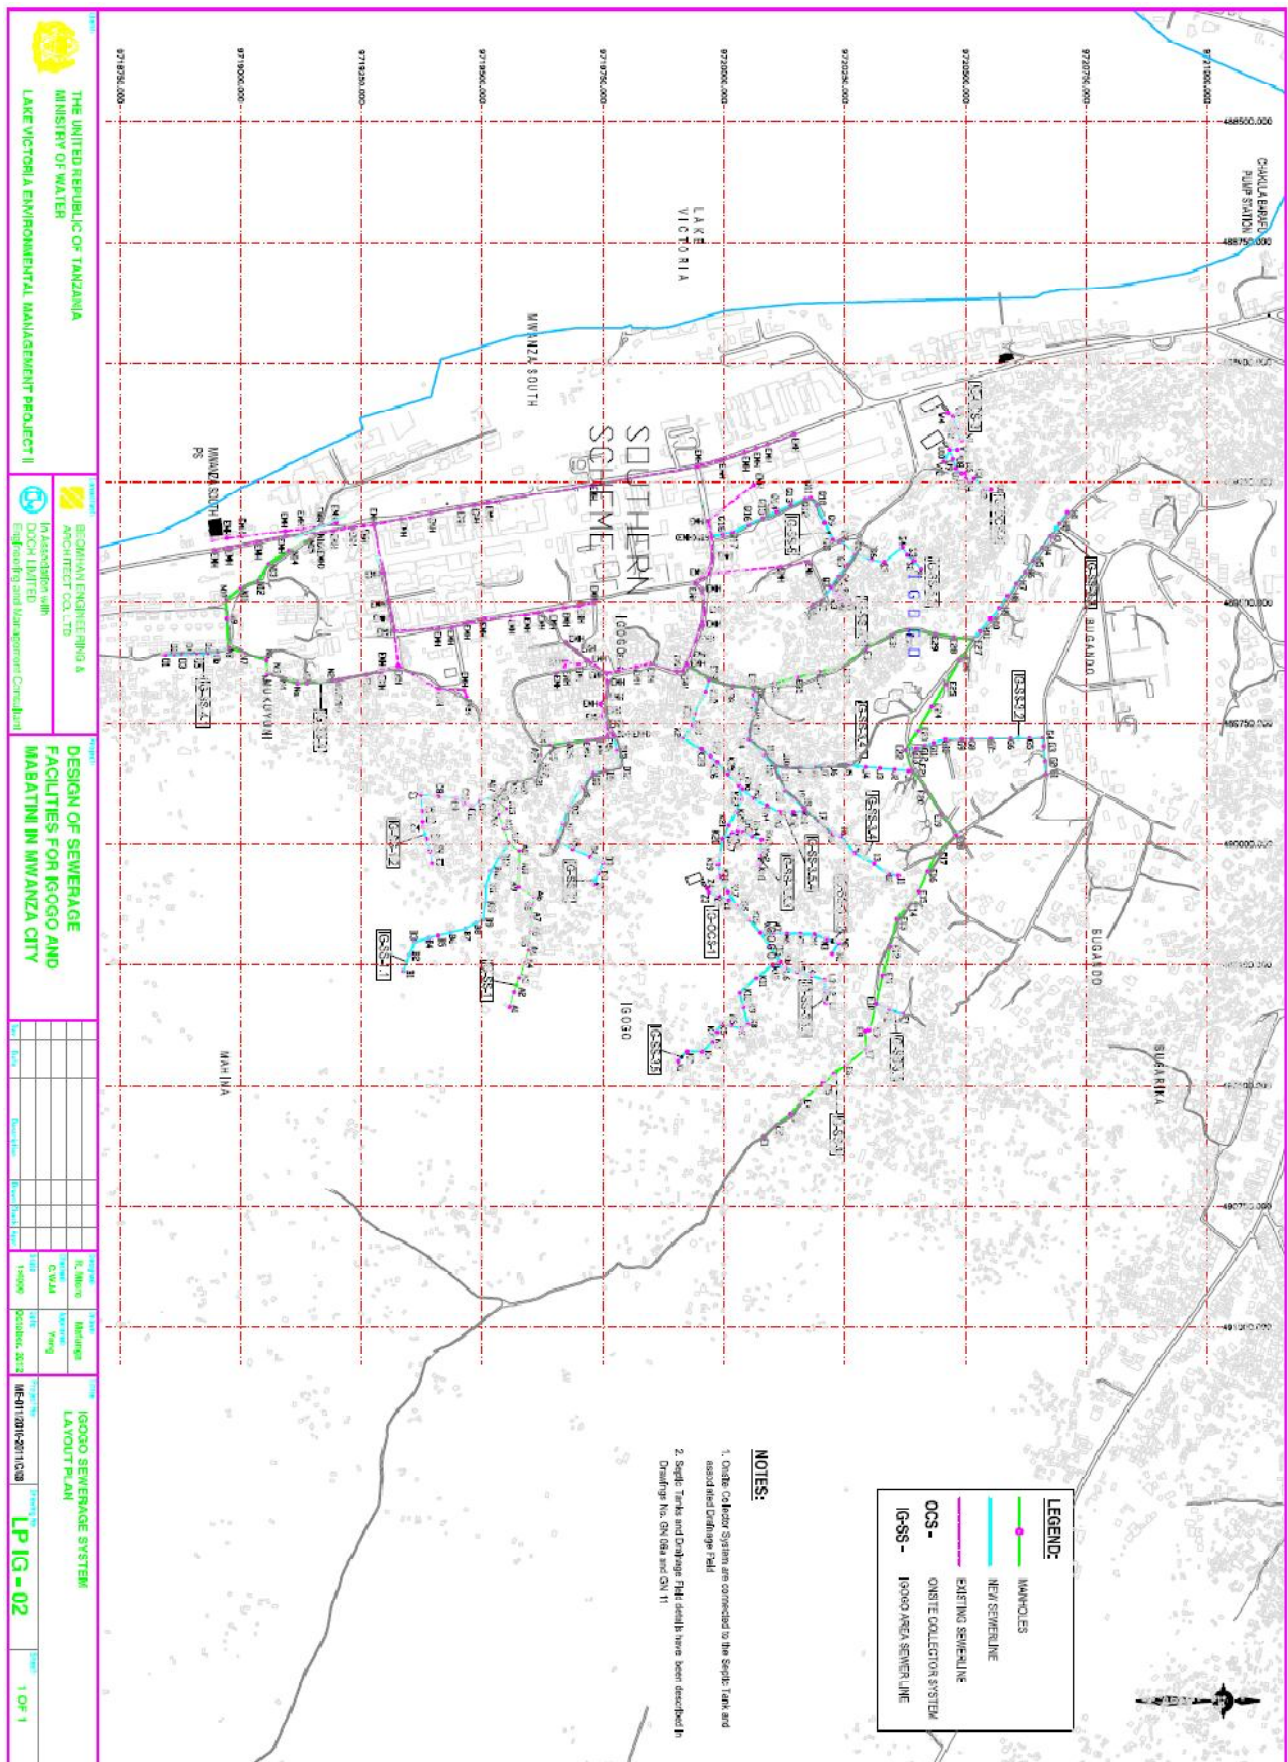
Igogo layout plan as matched to the existing buildings (for details see drawings on the appendices)
